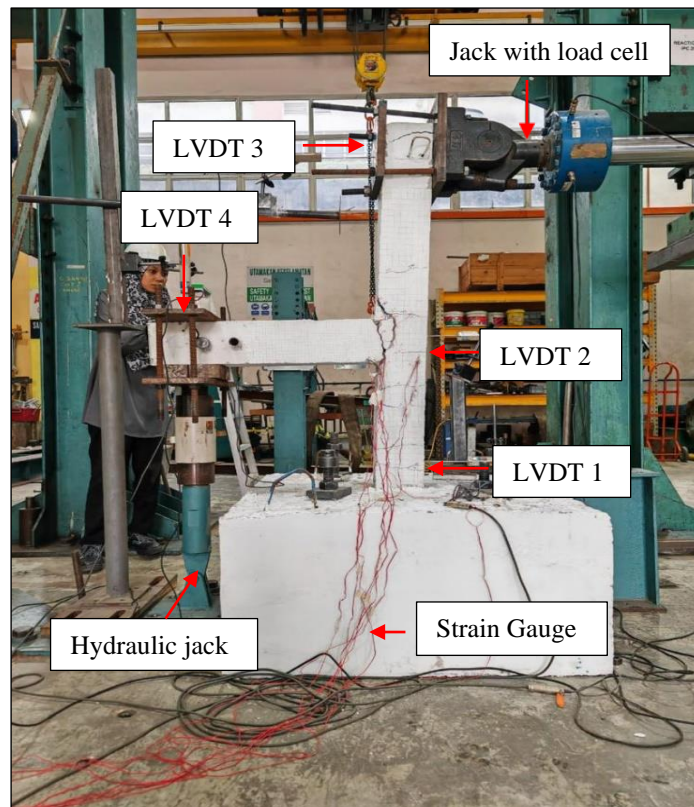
Beam-Column Joint During The Lateral Cyclic Loading Test
